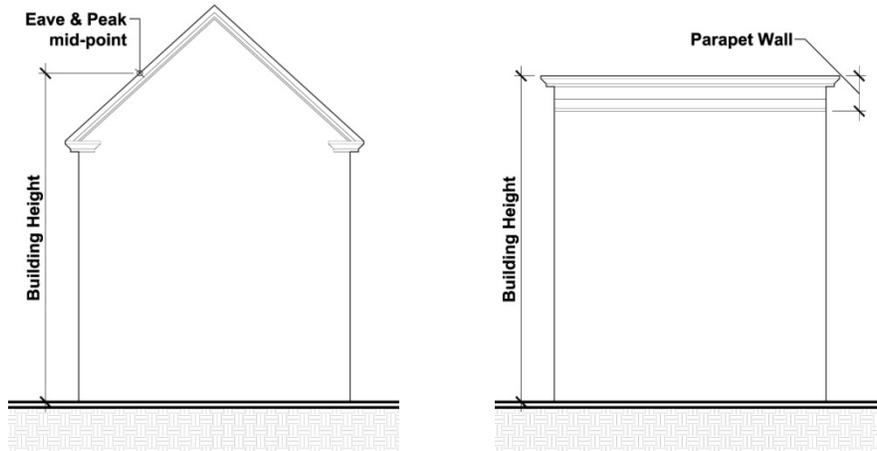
I: Example of building height measurement for a sloped roof (left) and a flat roof (right).
